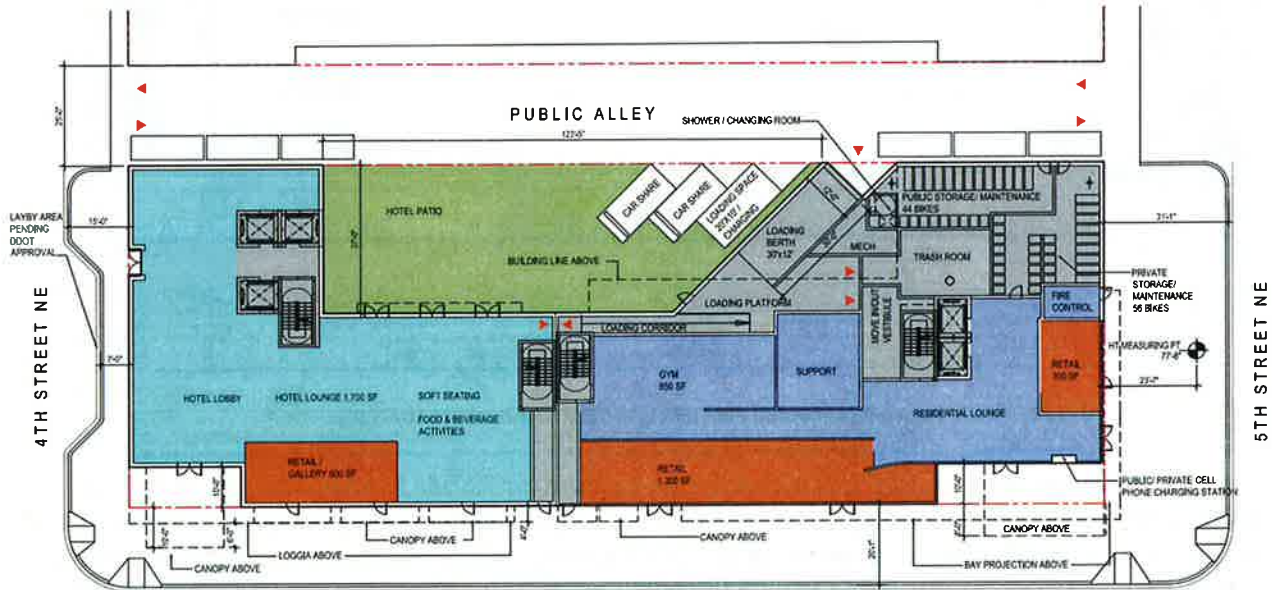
Site Design and Access (Source: SK&I Architecture 10/7/16)
